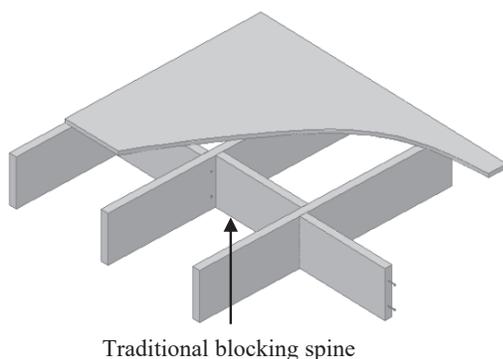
A wood floor with a row of traditional blocking elements connected by two nails with wood joists.
